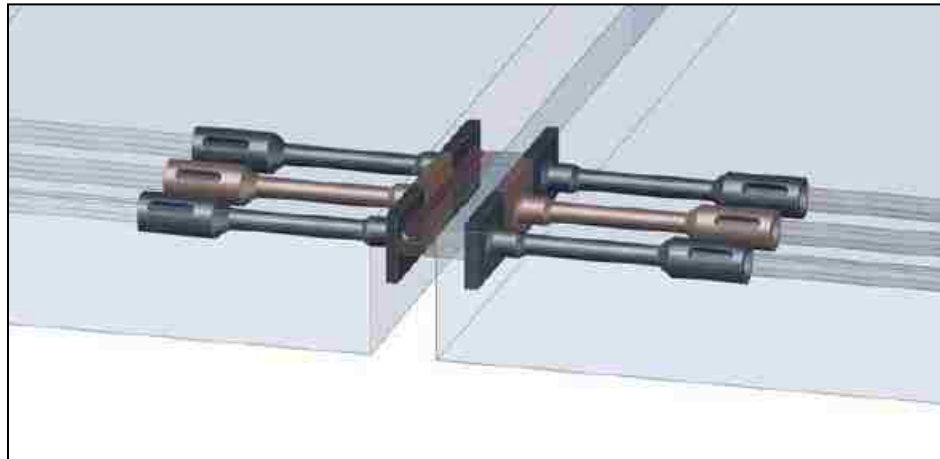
A typical panel-to-panel 3-Bar chord connection
